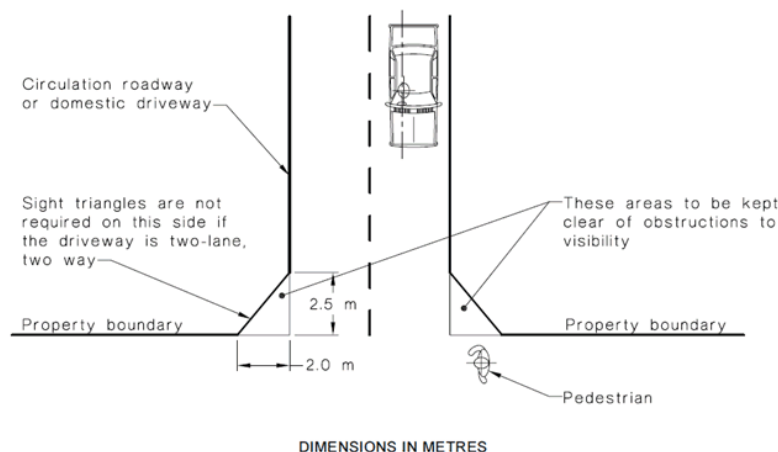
Proposed driveway splay requirements (AS/NZS 2890.1)
